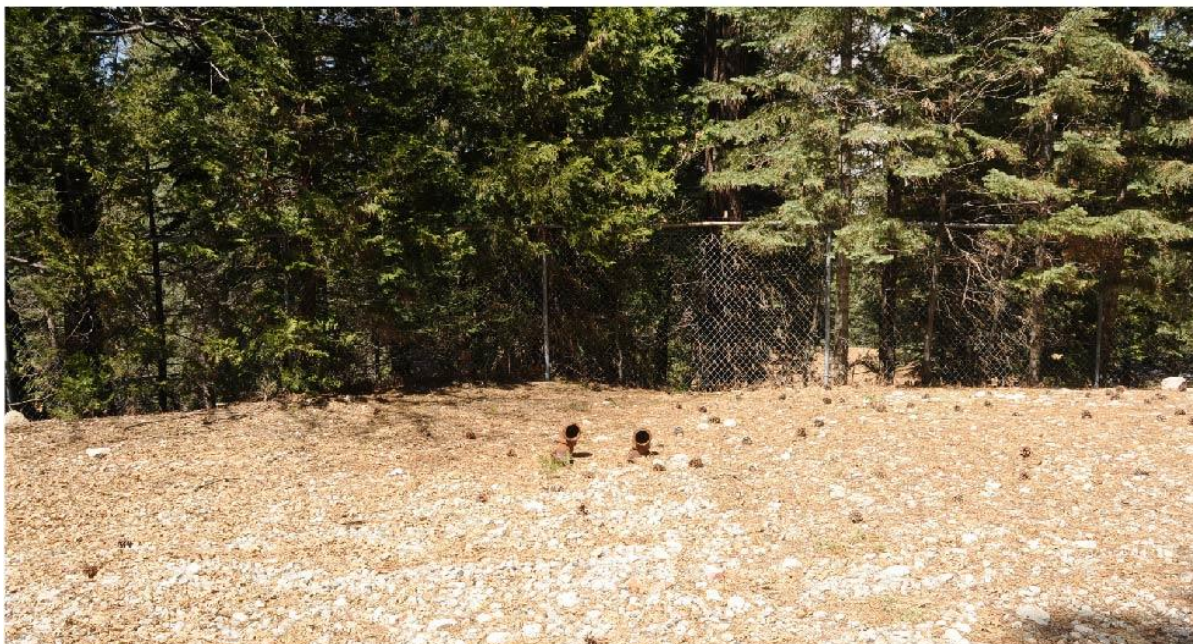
Proposed Project Location Interior Photograph Showing Gravel Base and Existing Pipe Stubs (Photo Taken Facing North).
